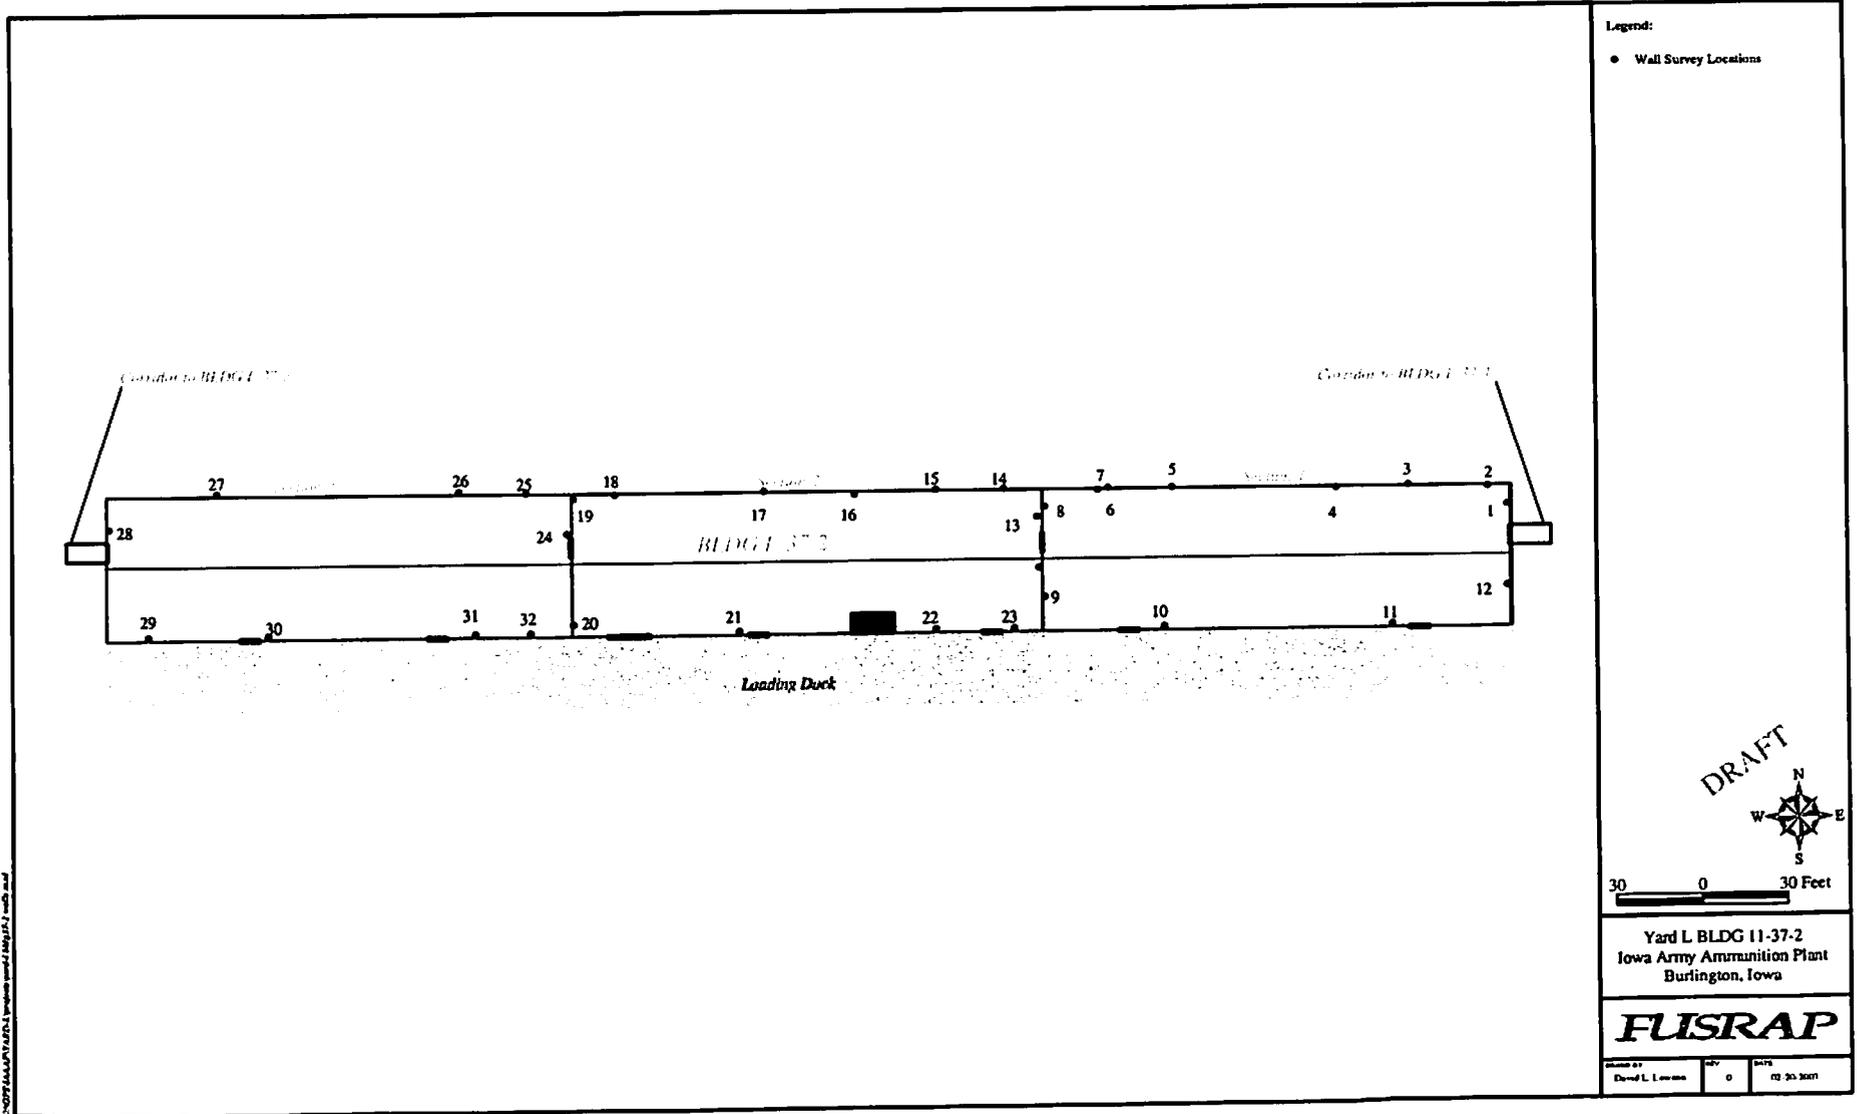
IAAAP Yard-L Building 11-37-2 Wall Survey Locations
